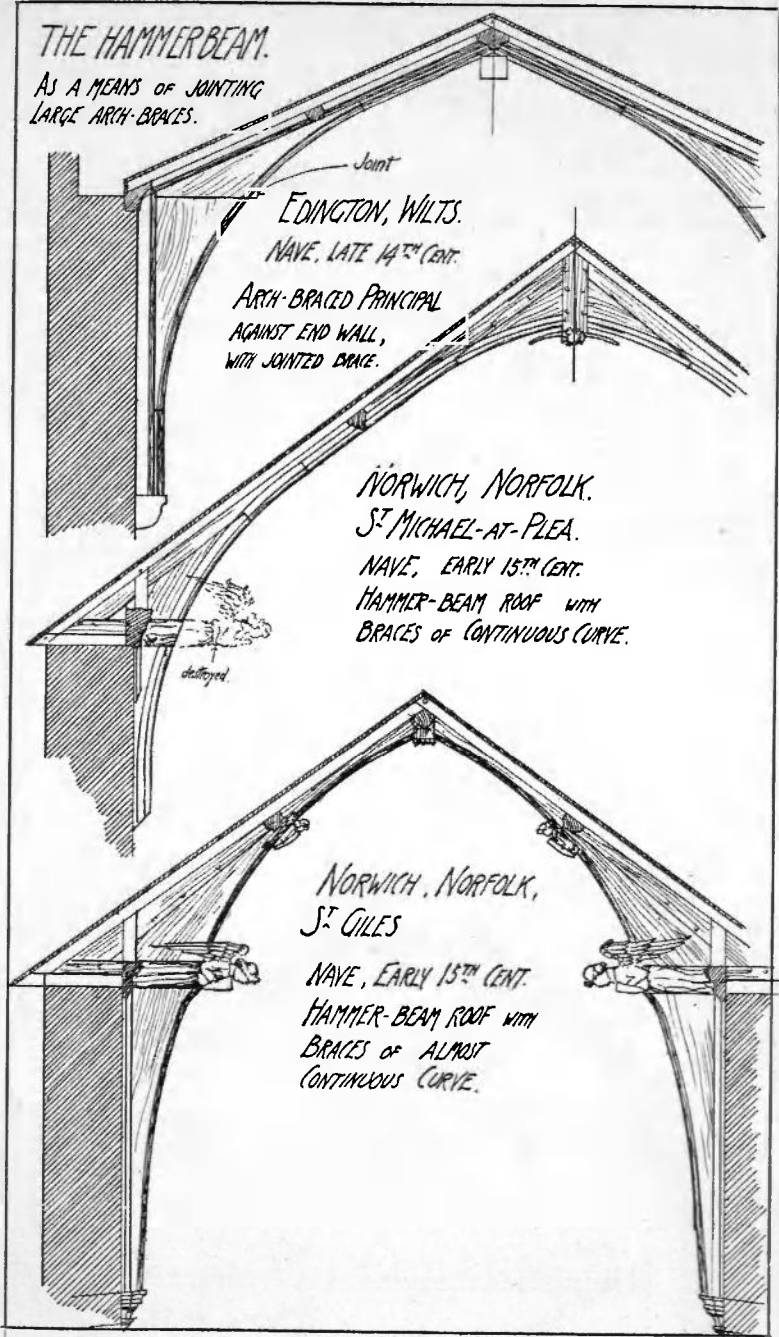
ARCH-BRACED ROOFS, DOUBLE-FRAMED, SHOWING DEVELOPMENT OF THE HAMMER-BEAM.
